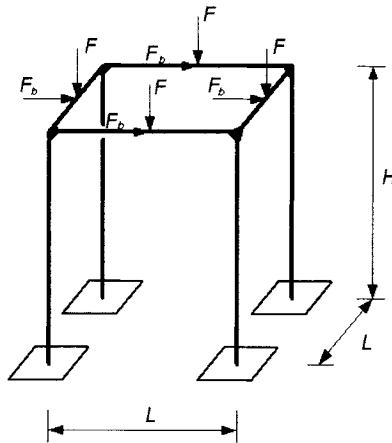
Supporting frame structure with vertical and horizontal forces
